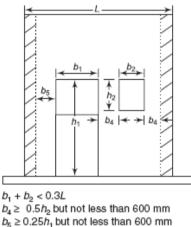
Recommended openings in bearing walls in rubble masonry (Source: ISET 1989)
